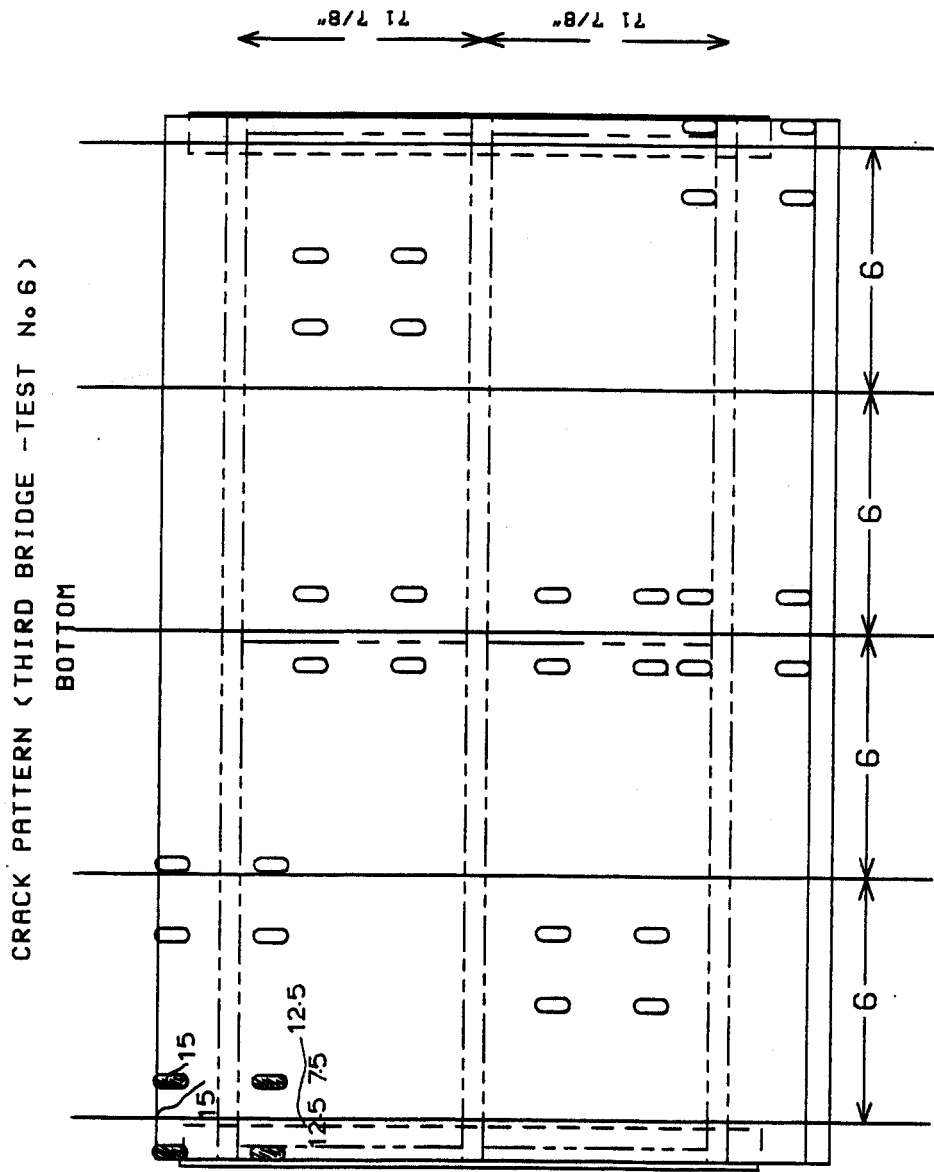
Bottom Cracking Pattern (Third Bridge - Test No. 6)
